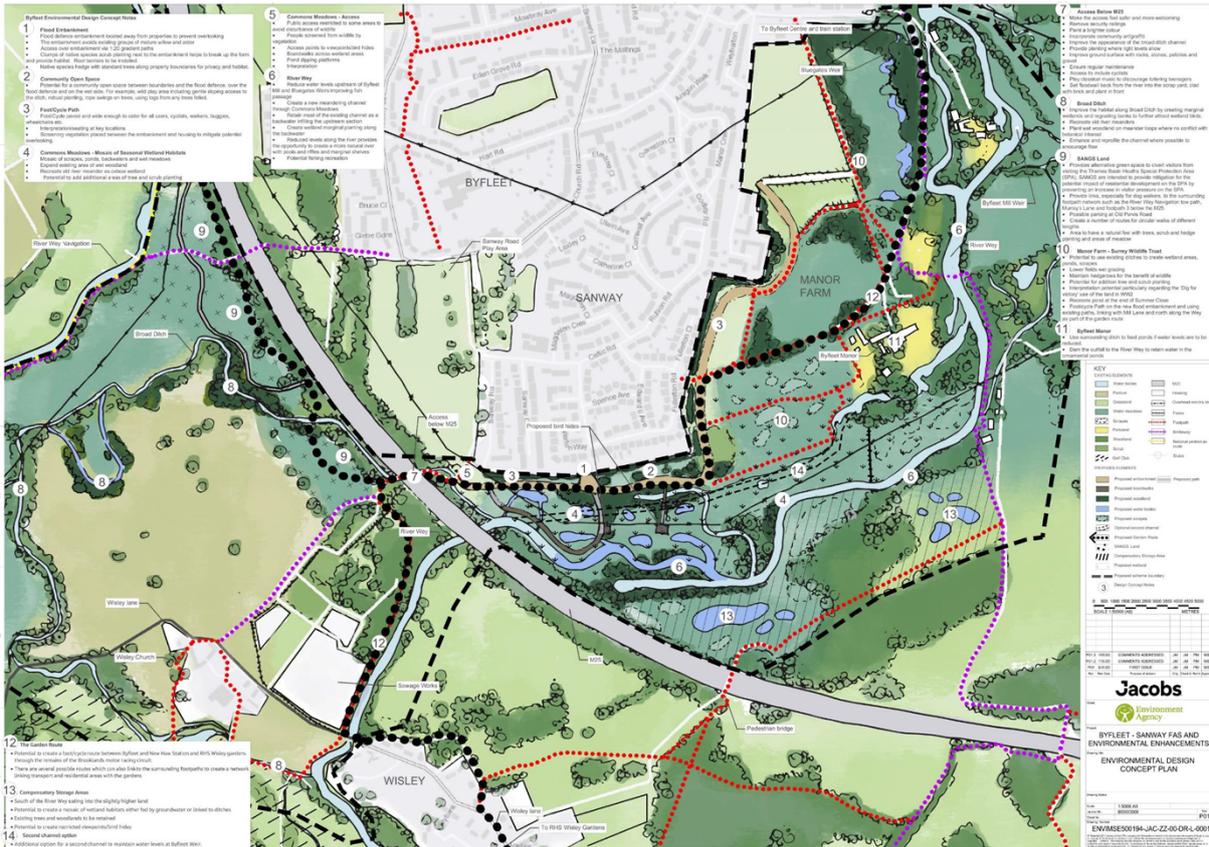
Environment Agency's Outline Design for Sanway-Byfleet FAS (2021)
